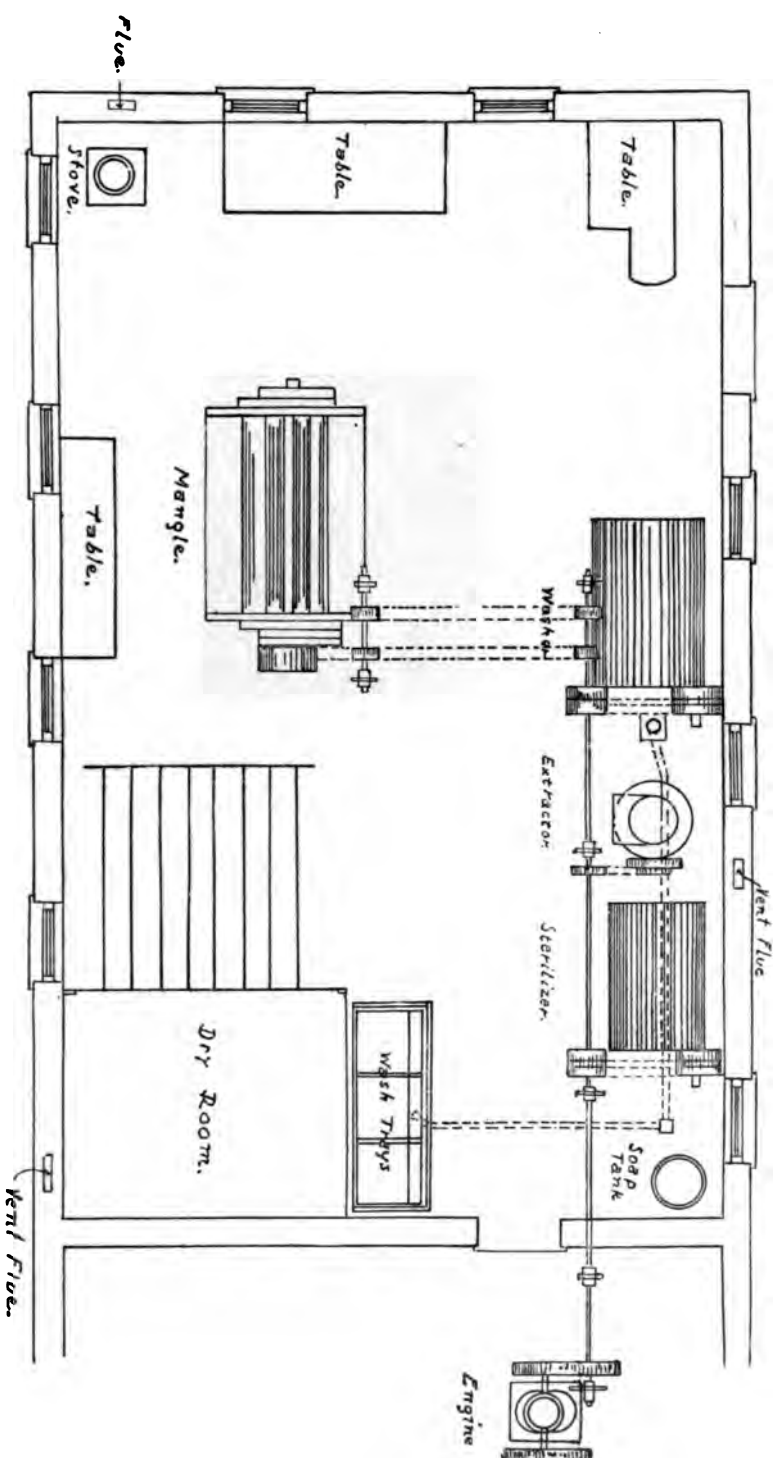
PLAN OF TYPICAL LAUNDRY IN PUBLIC BATH
